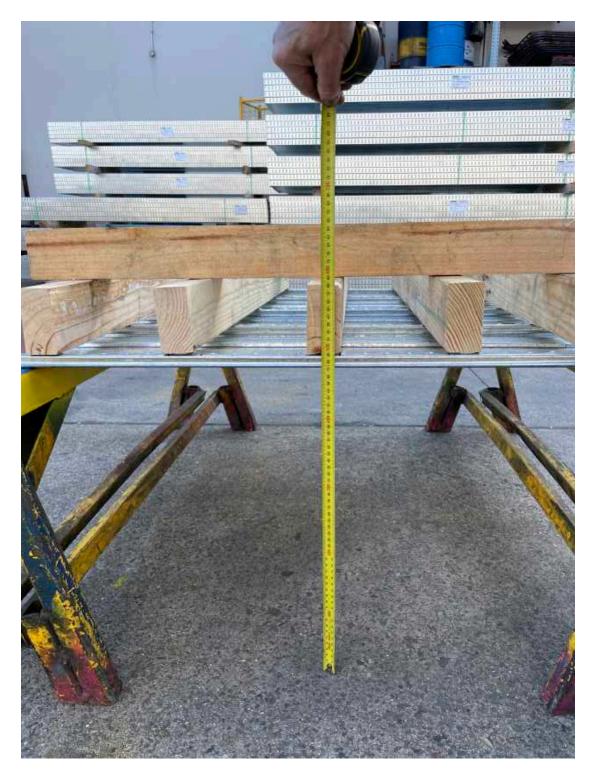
The 0.75mm BMT PremierDek 20 after unloading.
